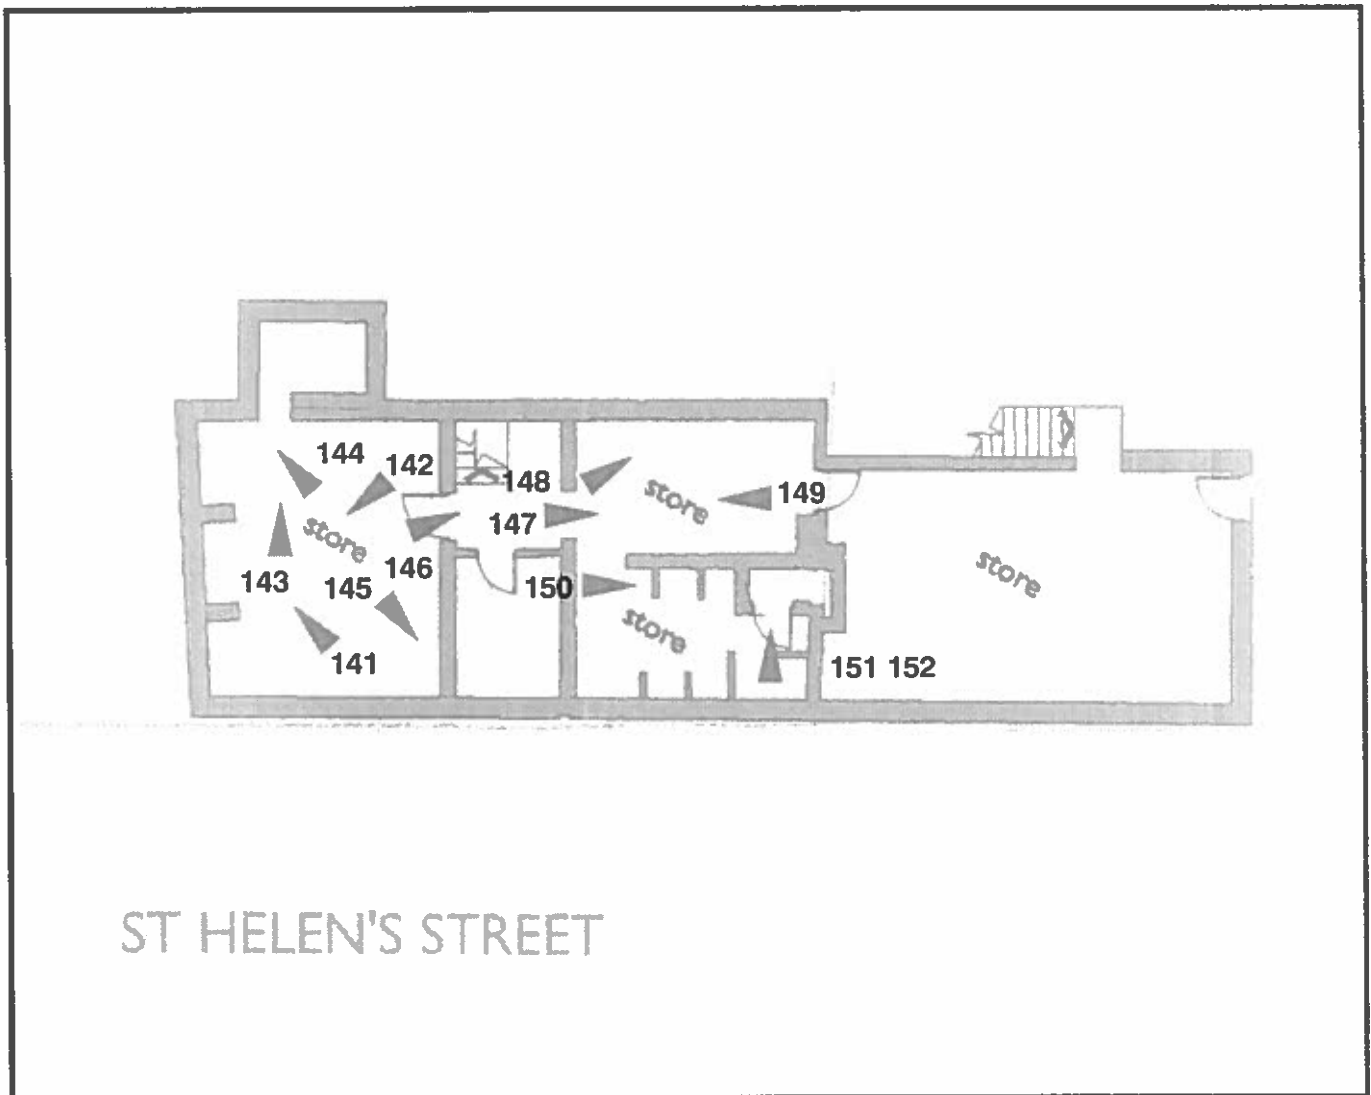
Viewpoints of archive photos of the cellars of 10 (and 8) St Helen's Street, Derby, with outline of ground plan shown in red. Not to scale. Copy courtesy of Franklin Ellis Architects.
